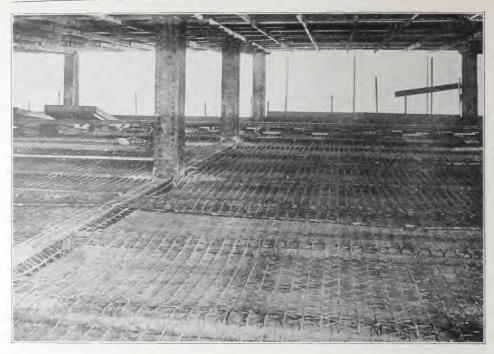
Seattle Warehouse, Triangle Mesh Fabric used for the Floors, Walls, Foundations and for Fireproofing of the Steel Framing.
